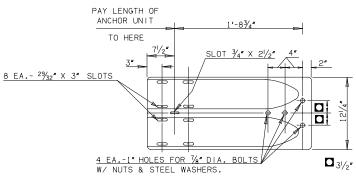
DETAIL OF SPECIAL END SHOE ON CONCRETE ANCHOR
